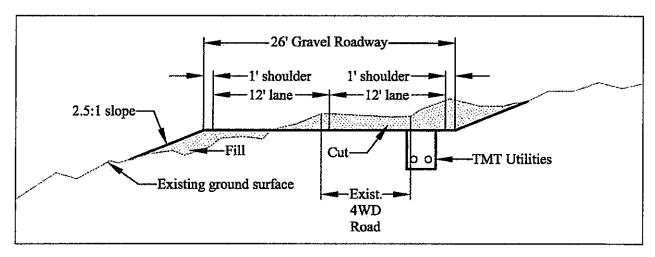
General Cross Section of Access Way in Lava Flow Section Overlapping 4-Wheel Drive Road
